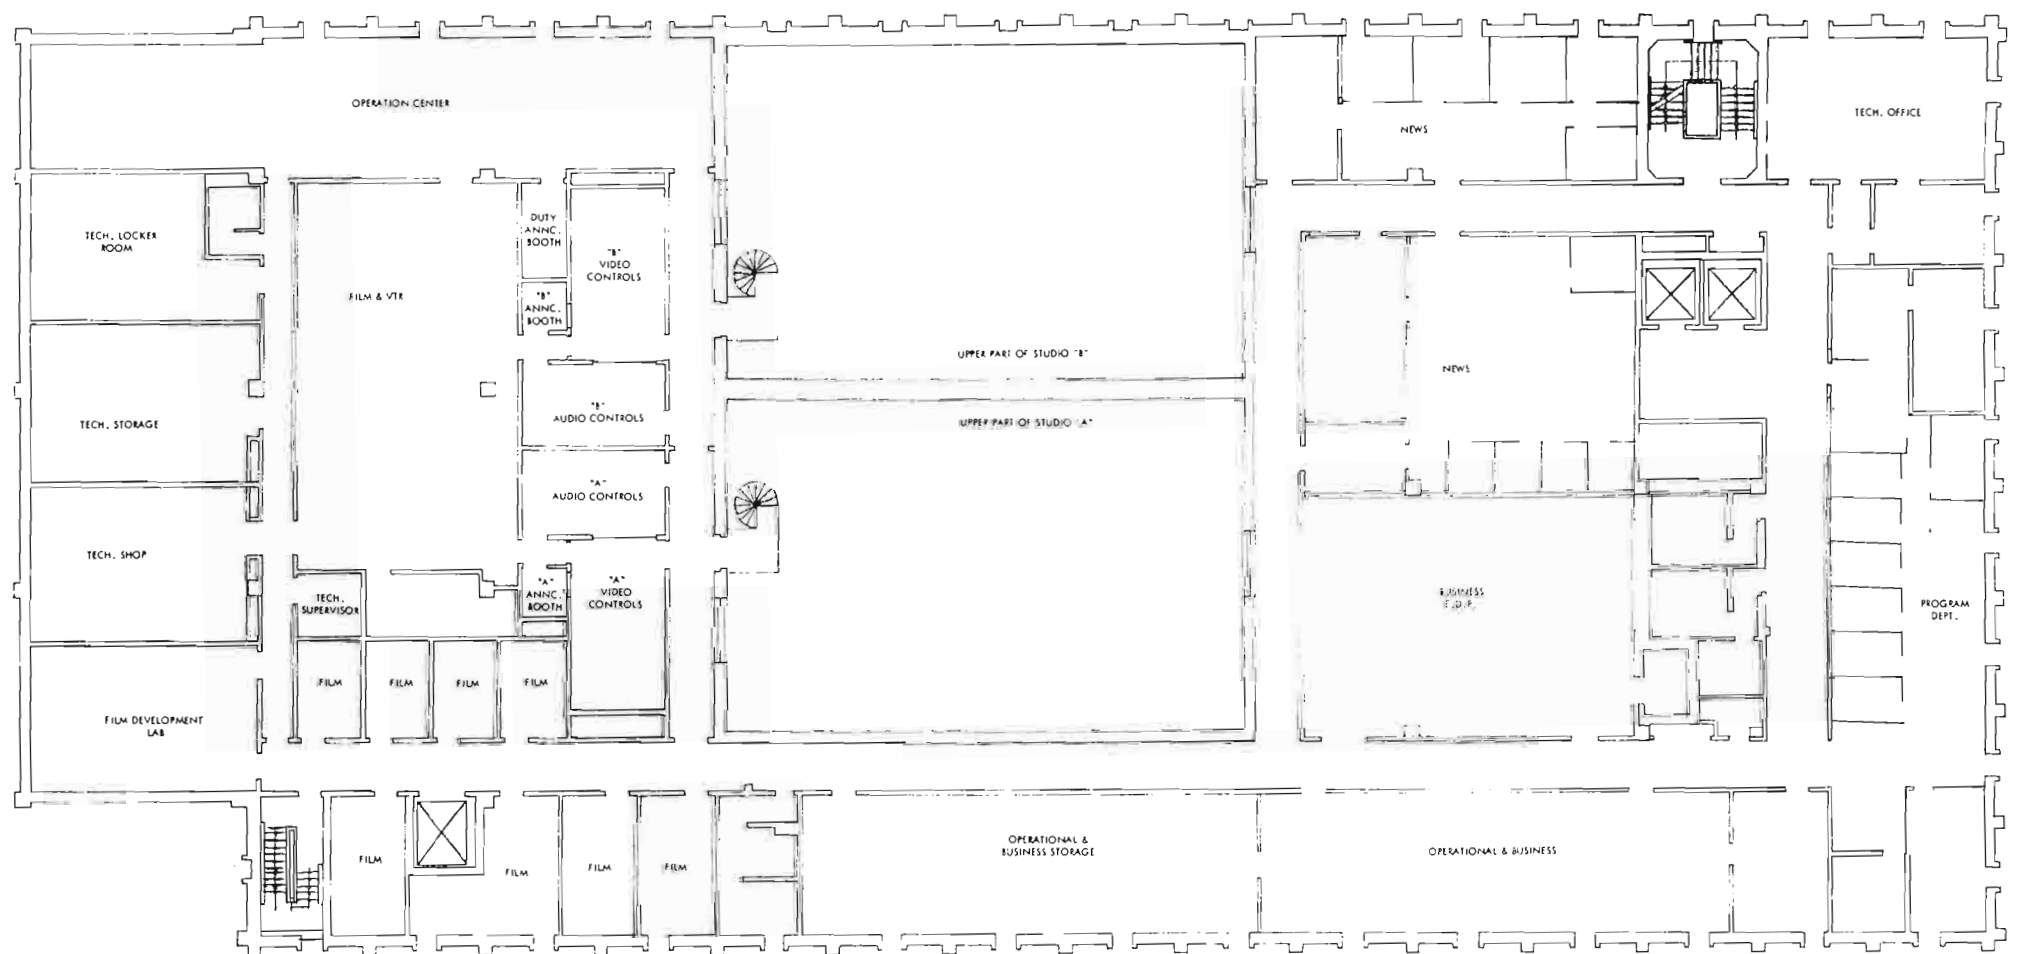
Fourth-floor plan — new KRON-TV Building.
